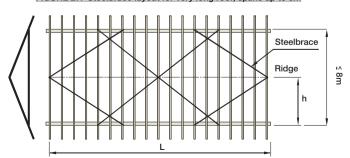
Steelbrace layout for long roof, spans up to 8m
